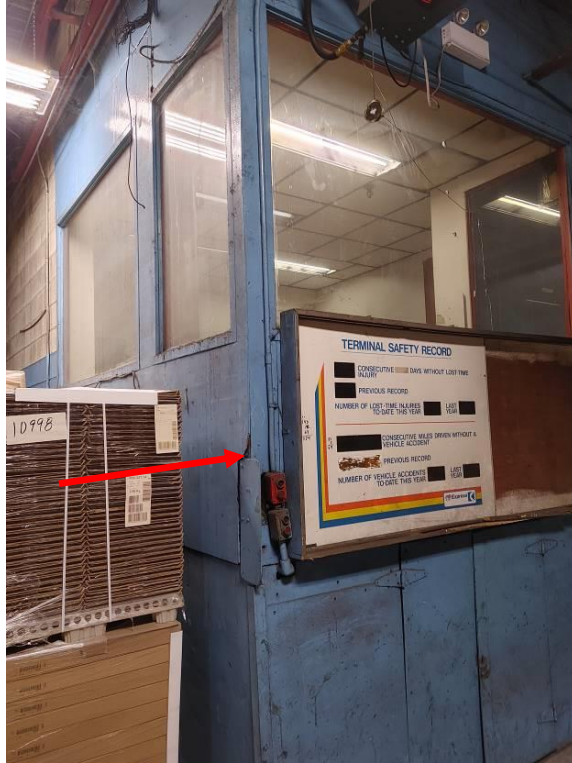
Asbestos-Containing Wall Board found in the north warehouse.
